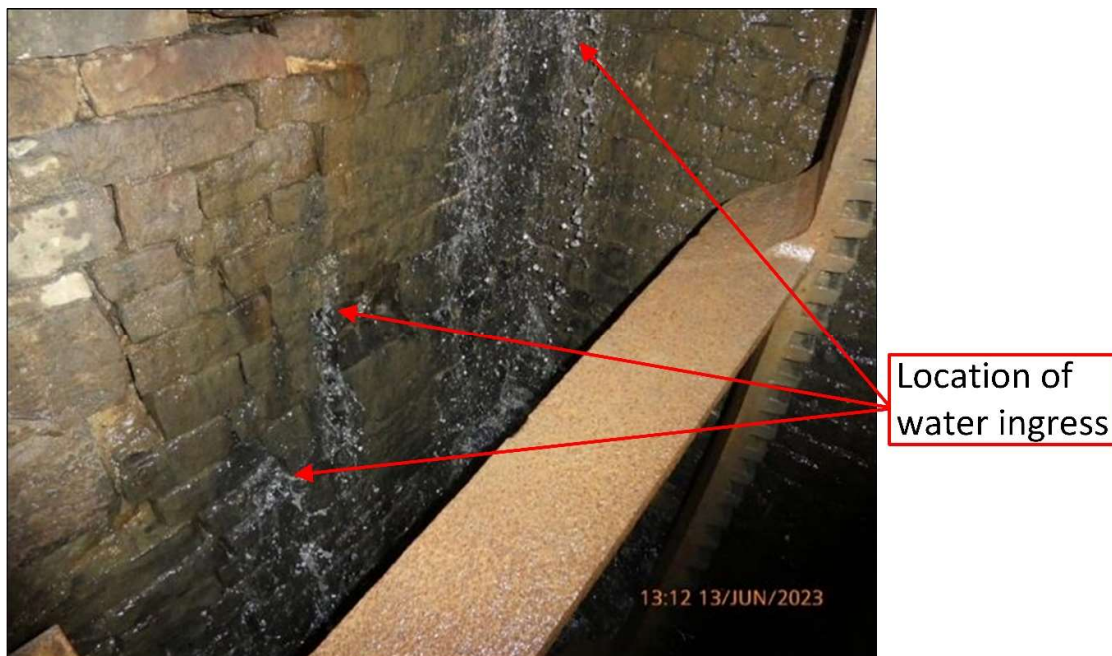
Significant water ingress through the walls of the 'Grinding Hull' building
